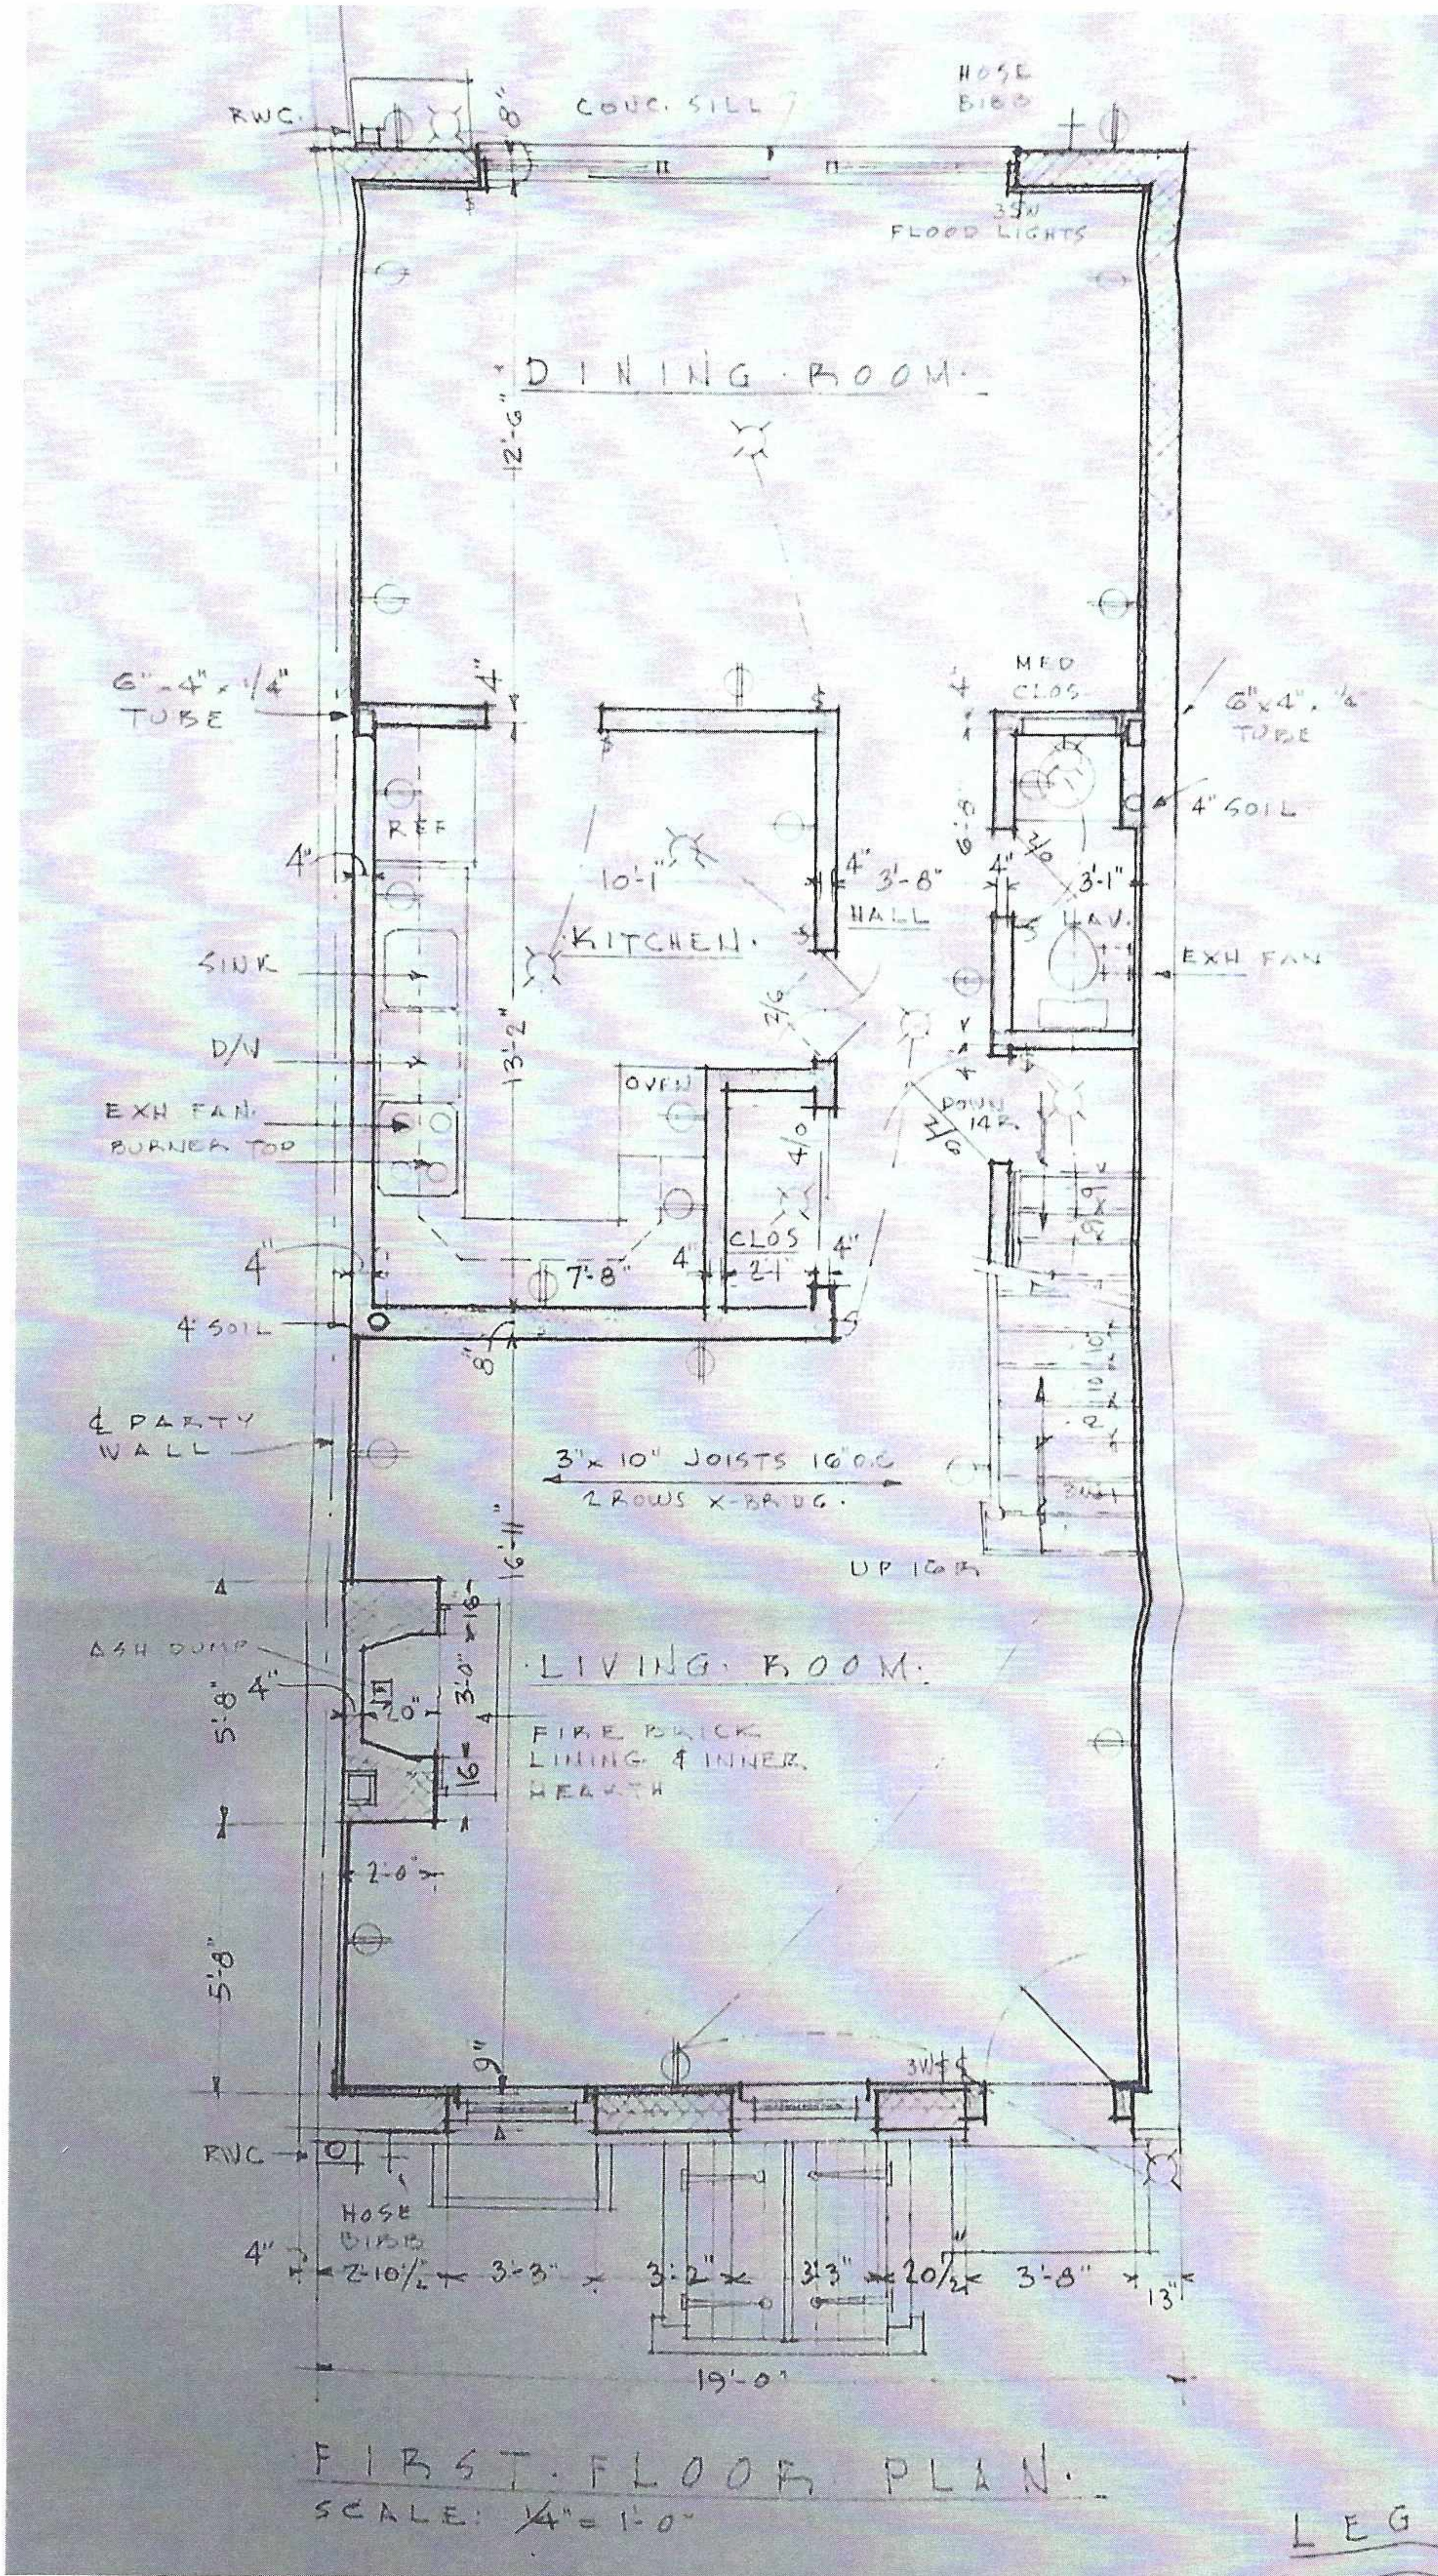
As shown in this first floor plan from 1967, architect Joseph Praissman designed the interior layout of 310 South 4th Street in a more modern manner. (Joseph Praissman, Architect, "Alterations to Residence, 310 South Fourth Street, Philadelphia, Penna.," 1967, Folder: 310 S. 4th St, Philadelphia Historical Commission.)
